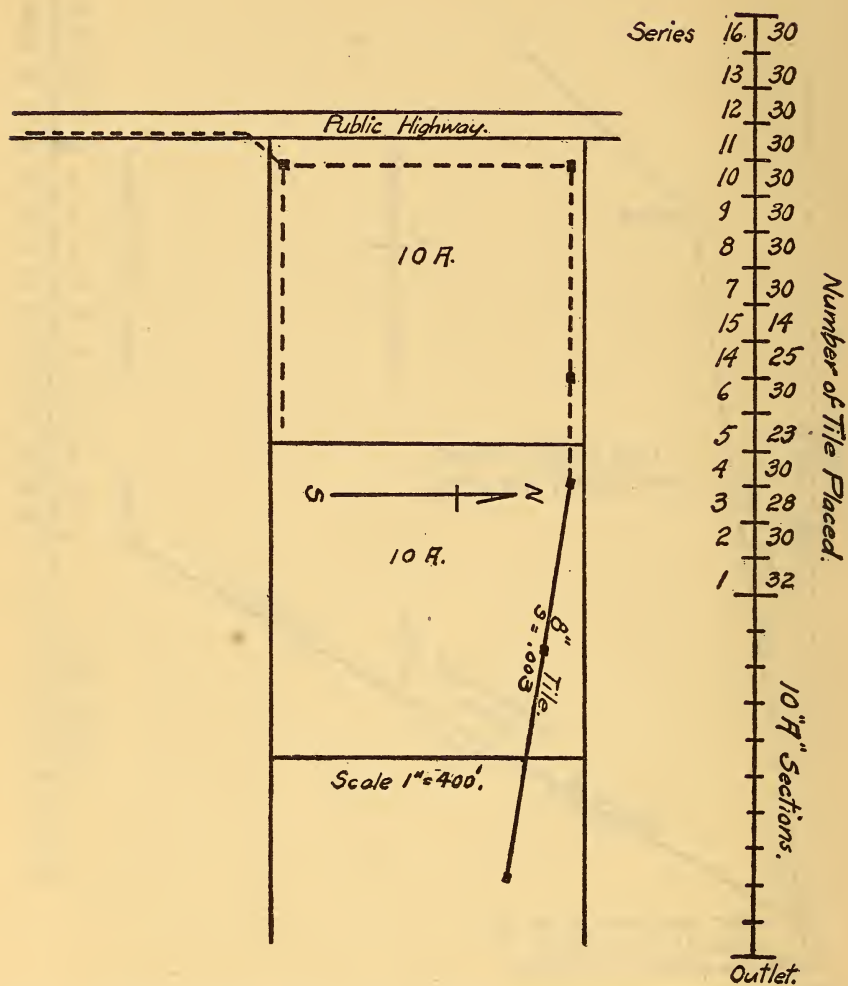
Showing location, plan, and arrangement of experimental drain tile at Grand Junction, Colo.
